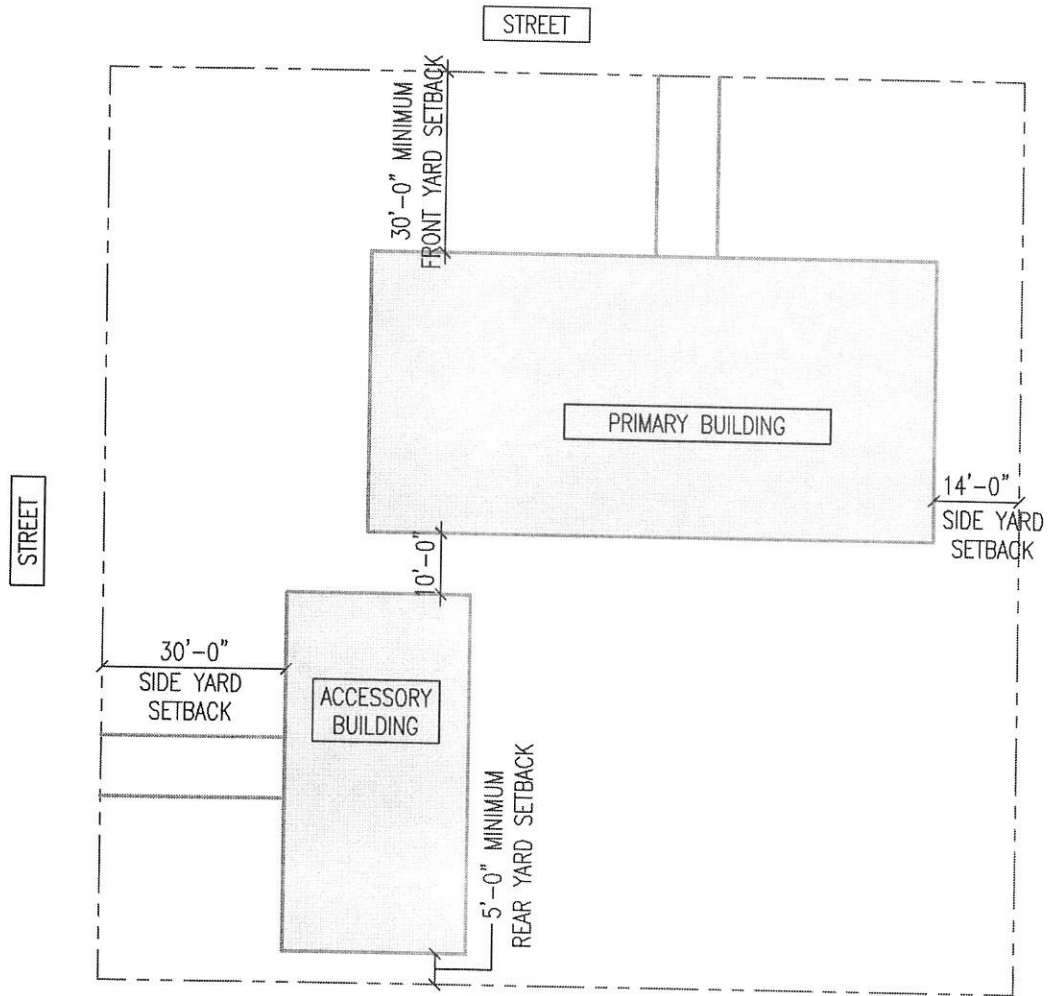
DETACHED ACCESSORY BUILDING EXAMPLE 3
